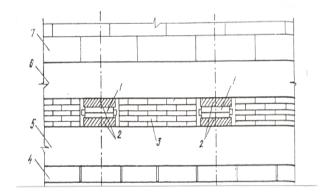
Foundation fit for jacking system application: 1-flat hydraulic jack; 2-distribution pads; 3-brickwork; 4cushions; 5, 6 –lower and upper distribution belts; 7–basement walls.
